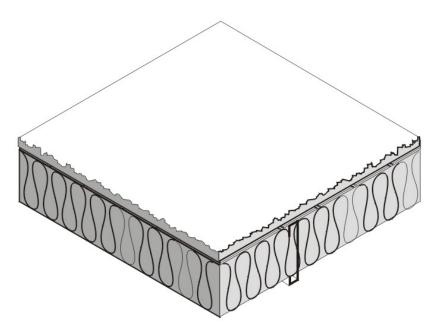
Metal Framed Floors with a Crawl Space
